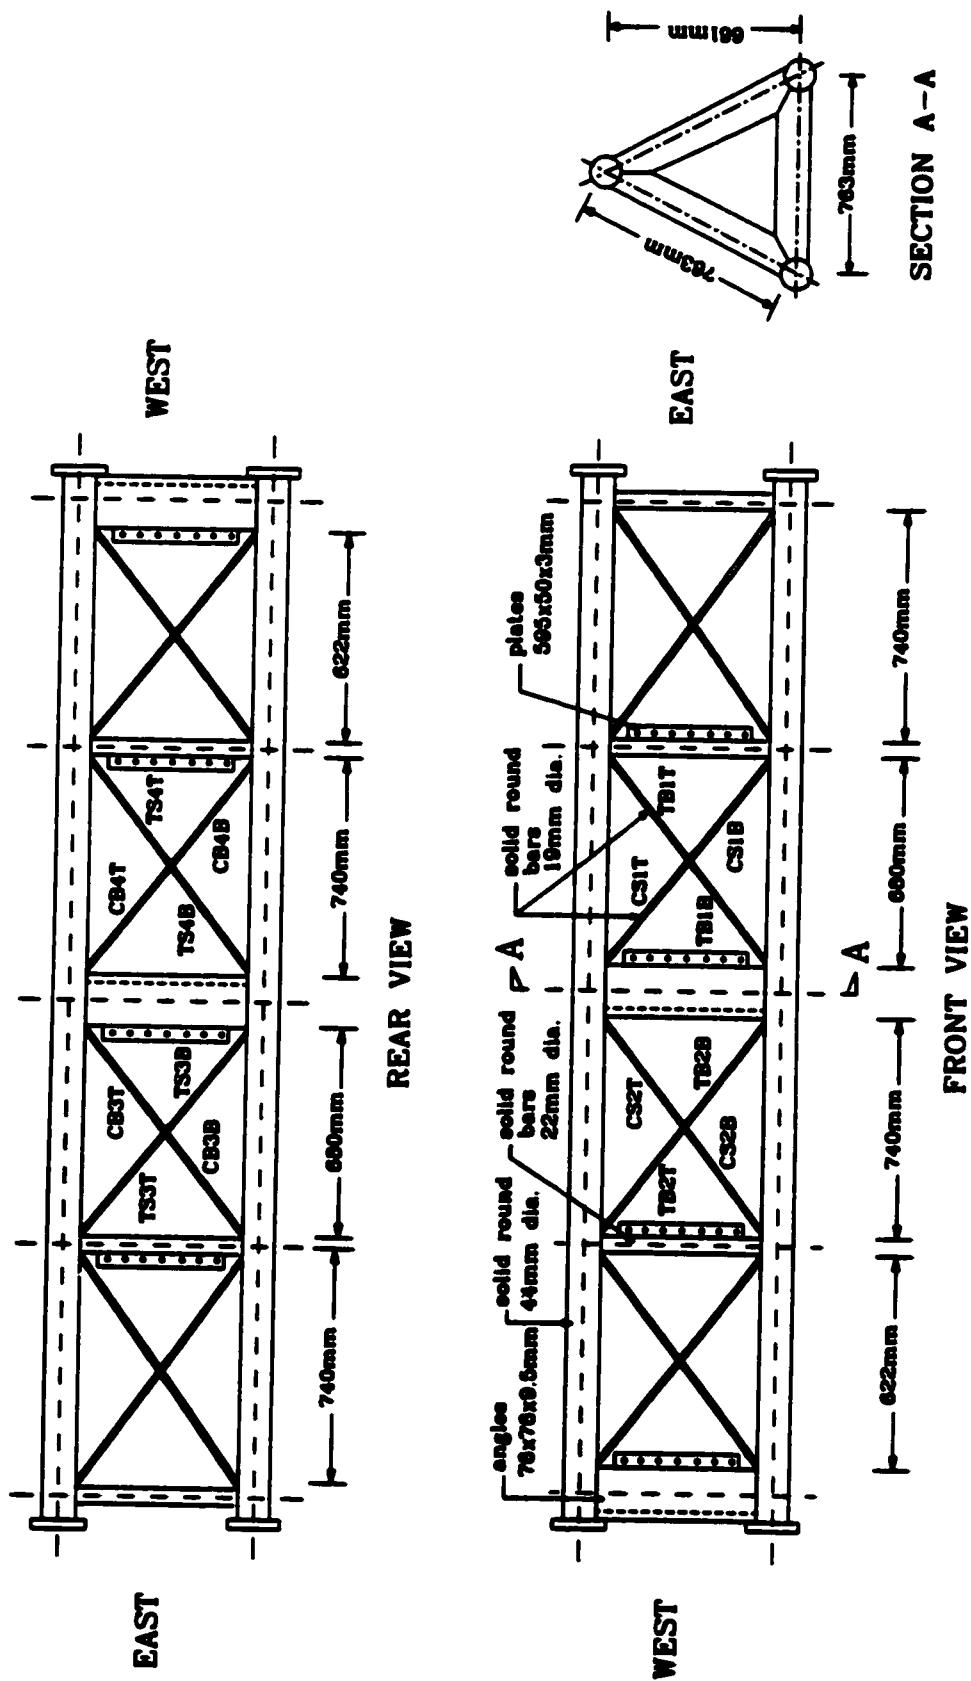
Dimensions of Specimens TR1 to TR4
